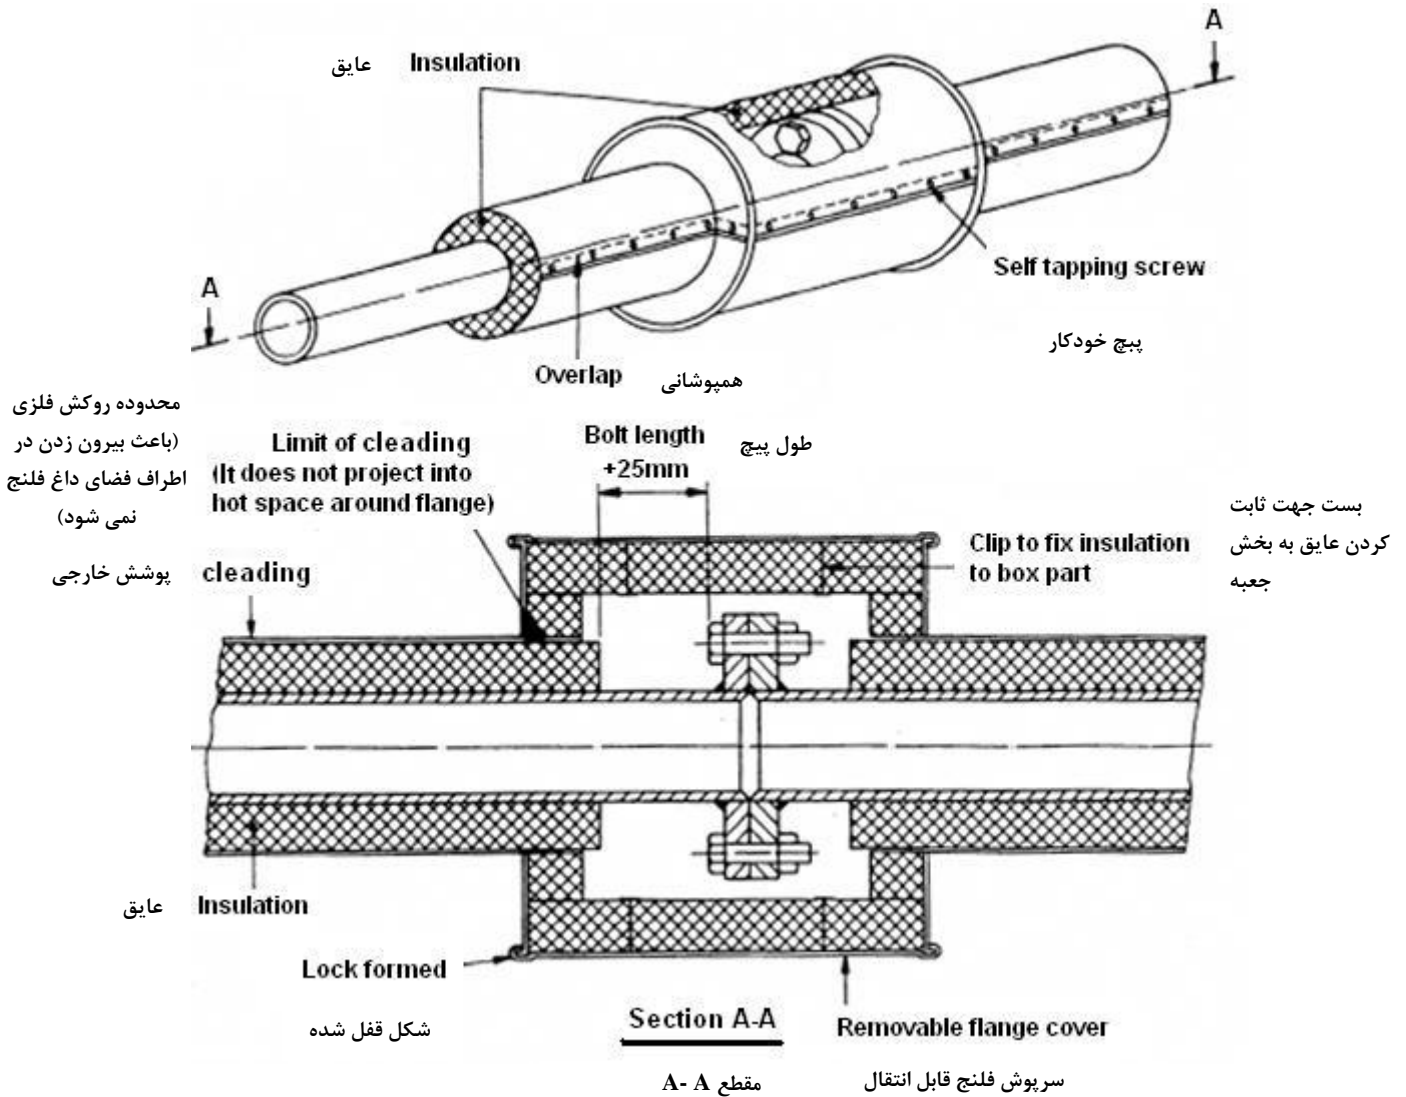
A METHOD OF INSULATING PIPE FLANGES
